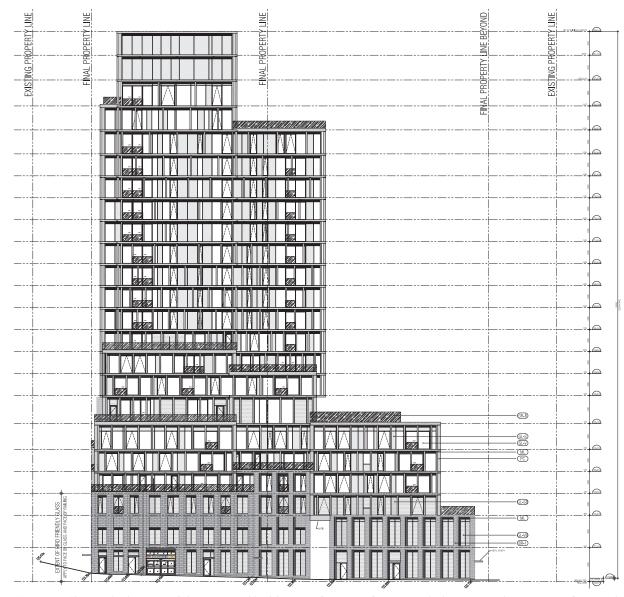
The north elevation of the proposed building at 5 Scrivener Square, with the proposed entrance to Summerhill Station (G+C Architects, 2021)
